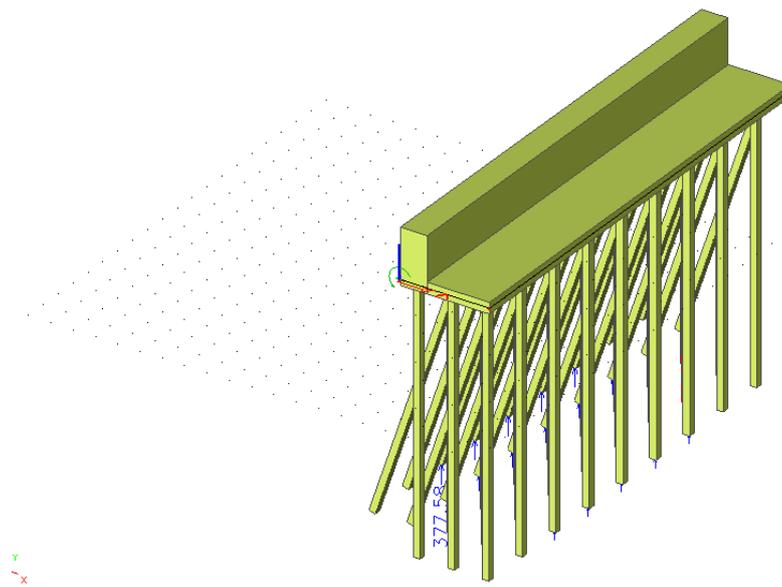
SCIA Engineer – Modeling pile structure - Biestebroek Dock (source: Technum)
